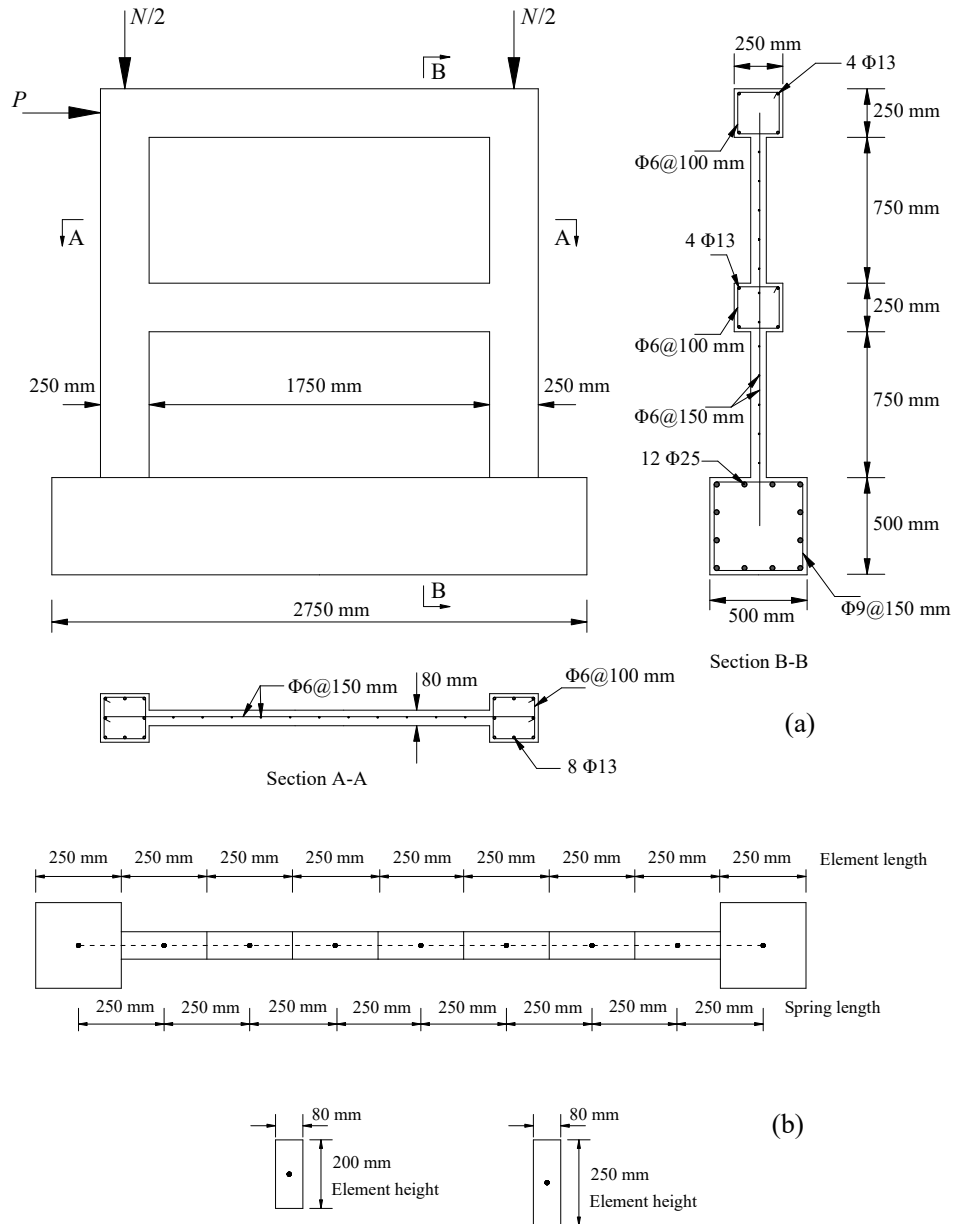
Wall specimen W7502 tested by Ono et al. (1976)
